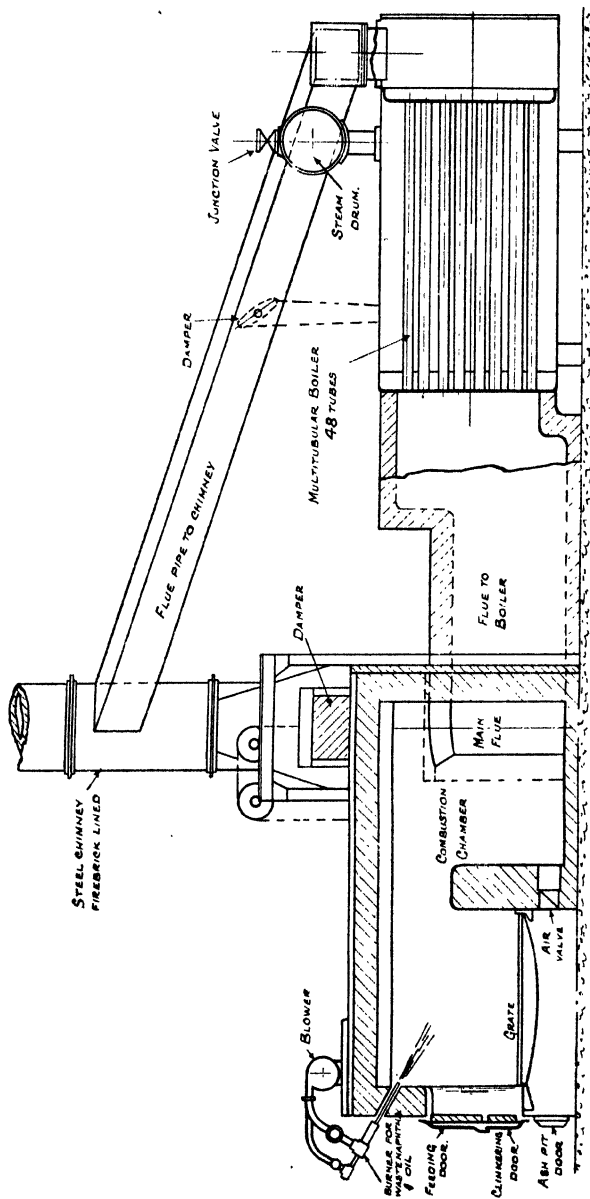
DIAGRAMMATIC LAYOUT OF HETNAN & FROUDE DESTROYER AND WASTE-HEAT BOILER
